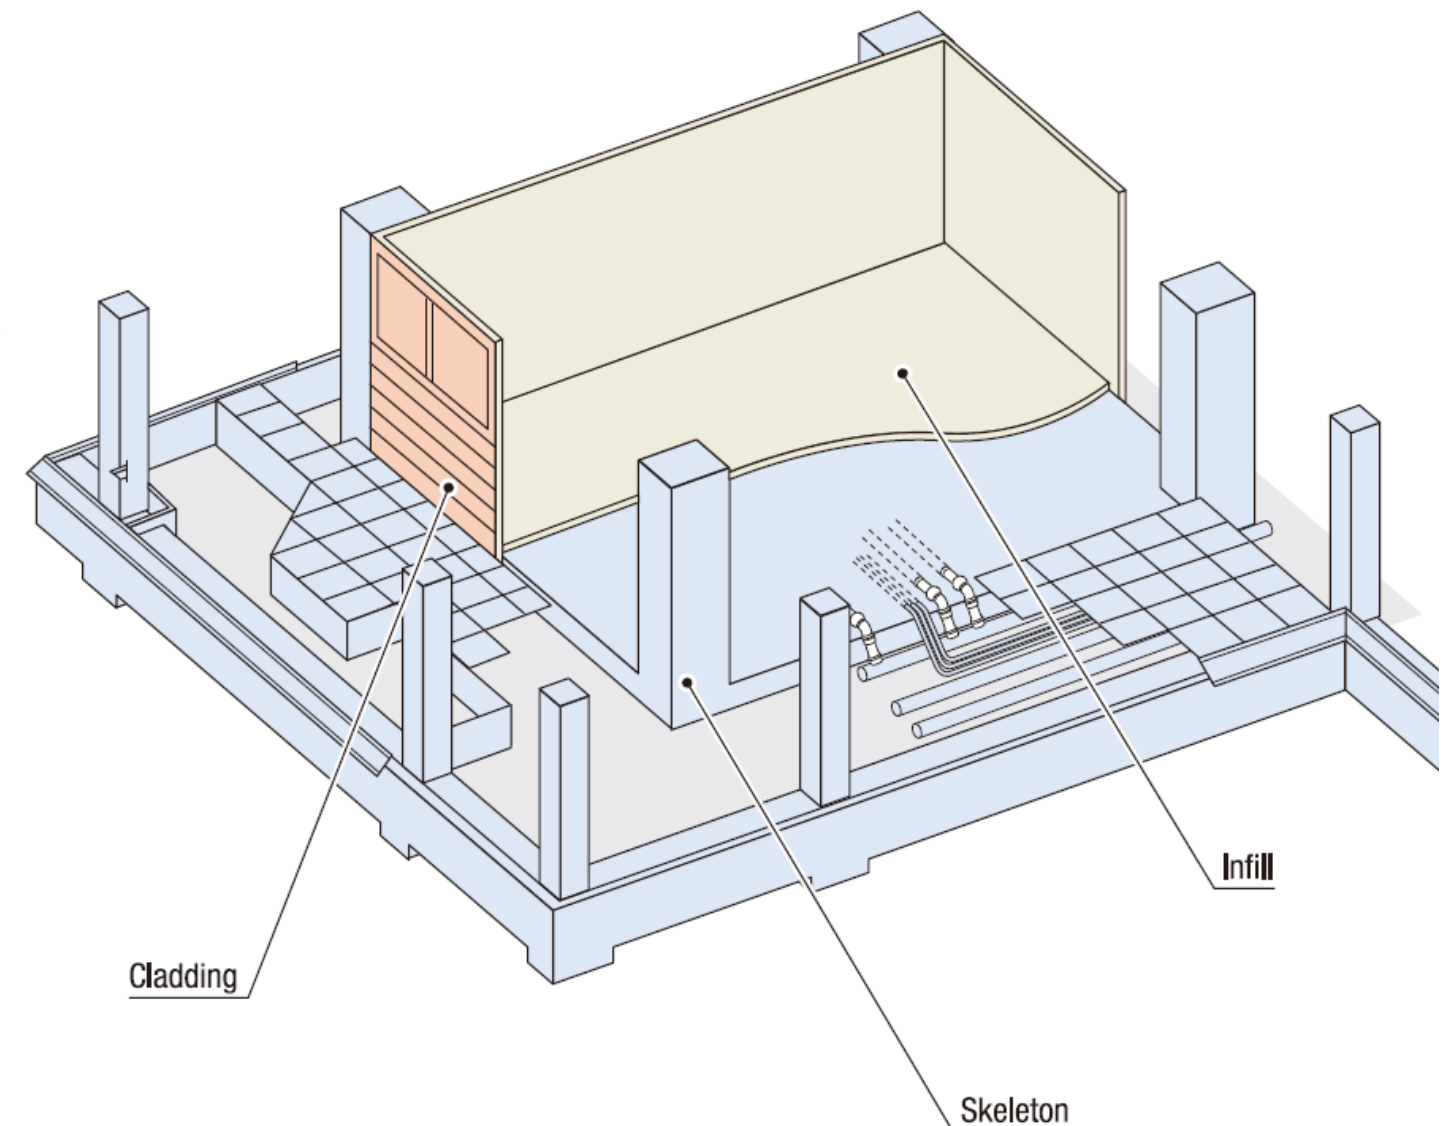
Building services entering a dwelling, isometric drawing. (Source: Osaka Gas Co, 2015)
